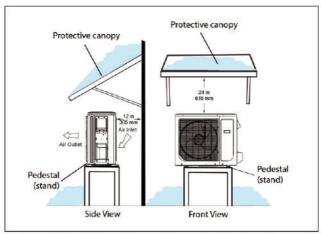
Outdoor Unit on Pedestal and Protective Canopy
